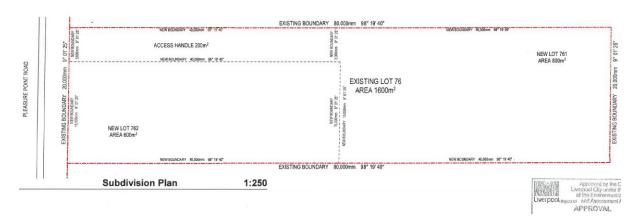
Approved Subdivision Plan DA-180/2015 (LCC E-Planning Portal)
